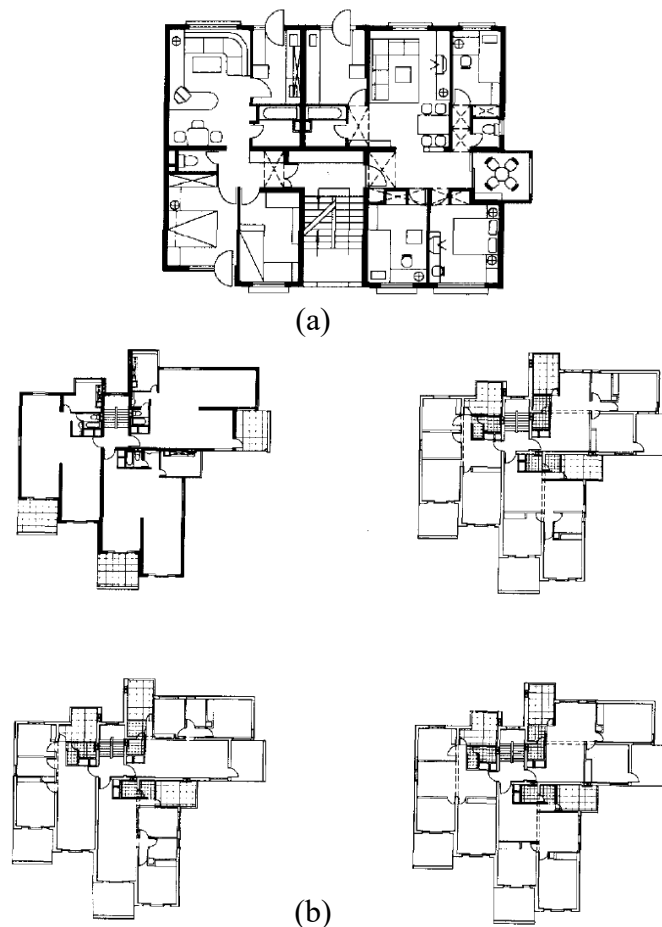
Shijiazhuang Xiaokang House Plan (a) and Yantai Terrace Garden House Plan (b). From Lü, Rowe, and Zhang (2001).
